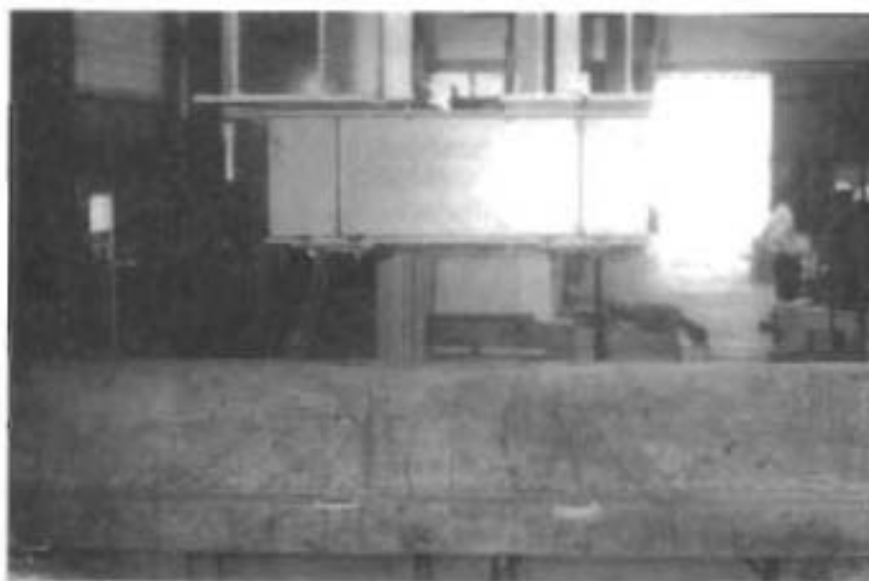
Cracking pattern and extent of cracking in specimen BMS1
